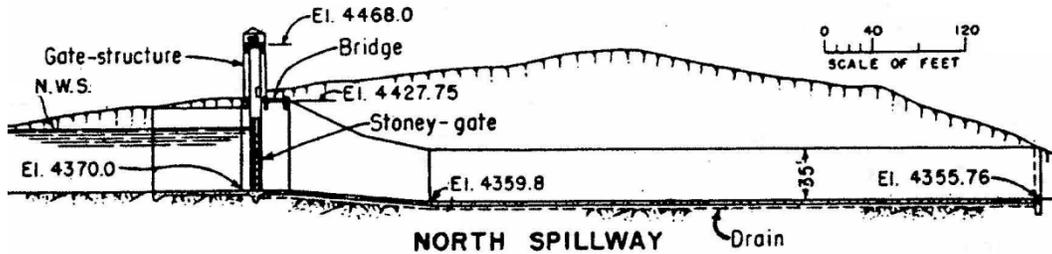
North Spillway, Note this drawing does not indicate the 8 in. concrete overlay that was placed on the spillway invert in 1983
